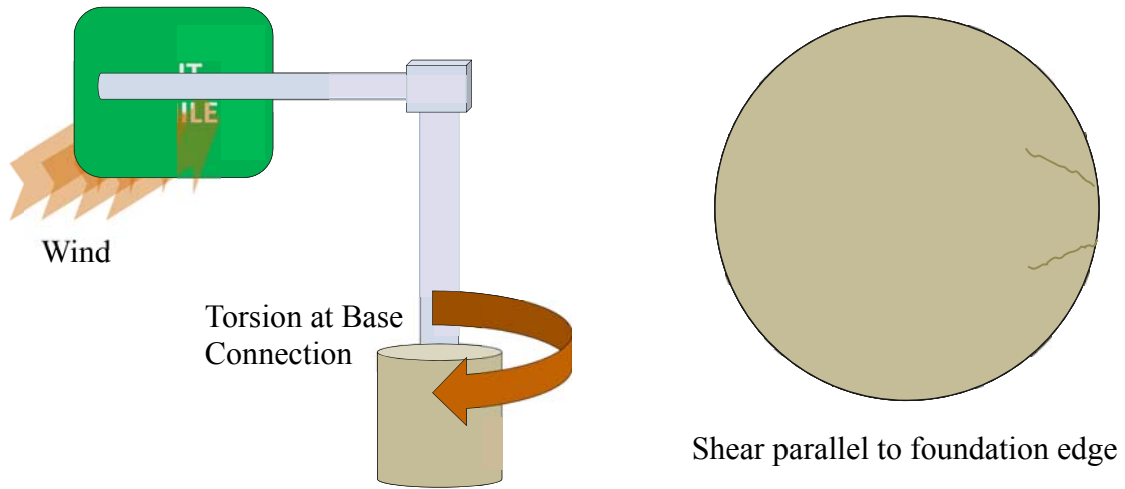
Transfer of wind load through cantilever structure to the foundation
